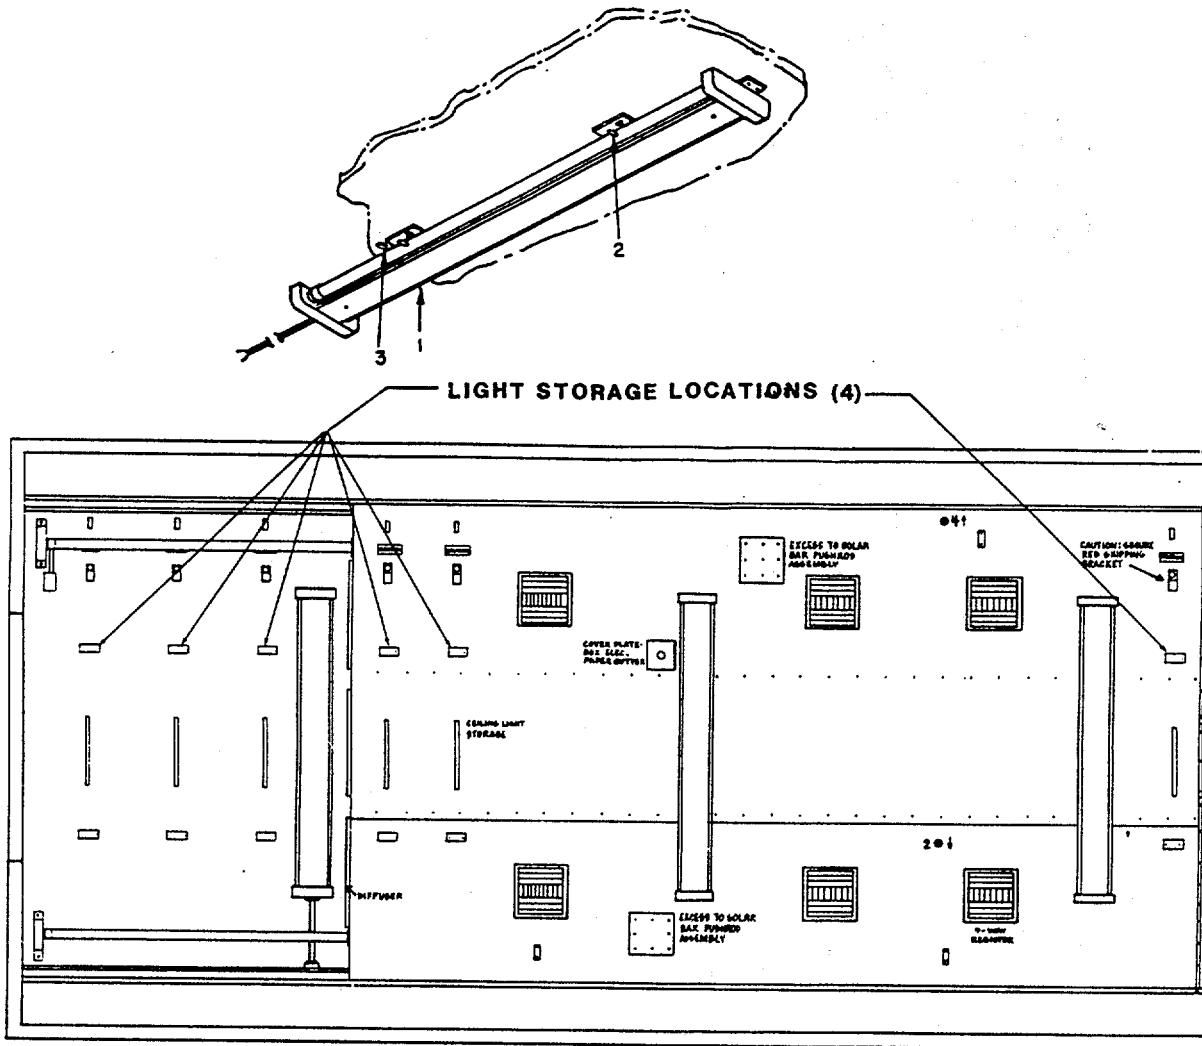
Ceiling Light Assemblies, Stored Location (View Looking up at Ceiling)
